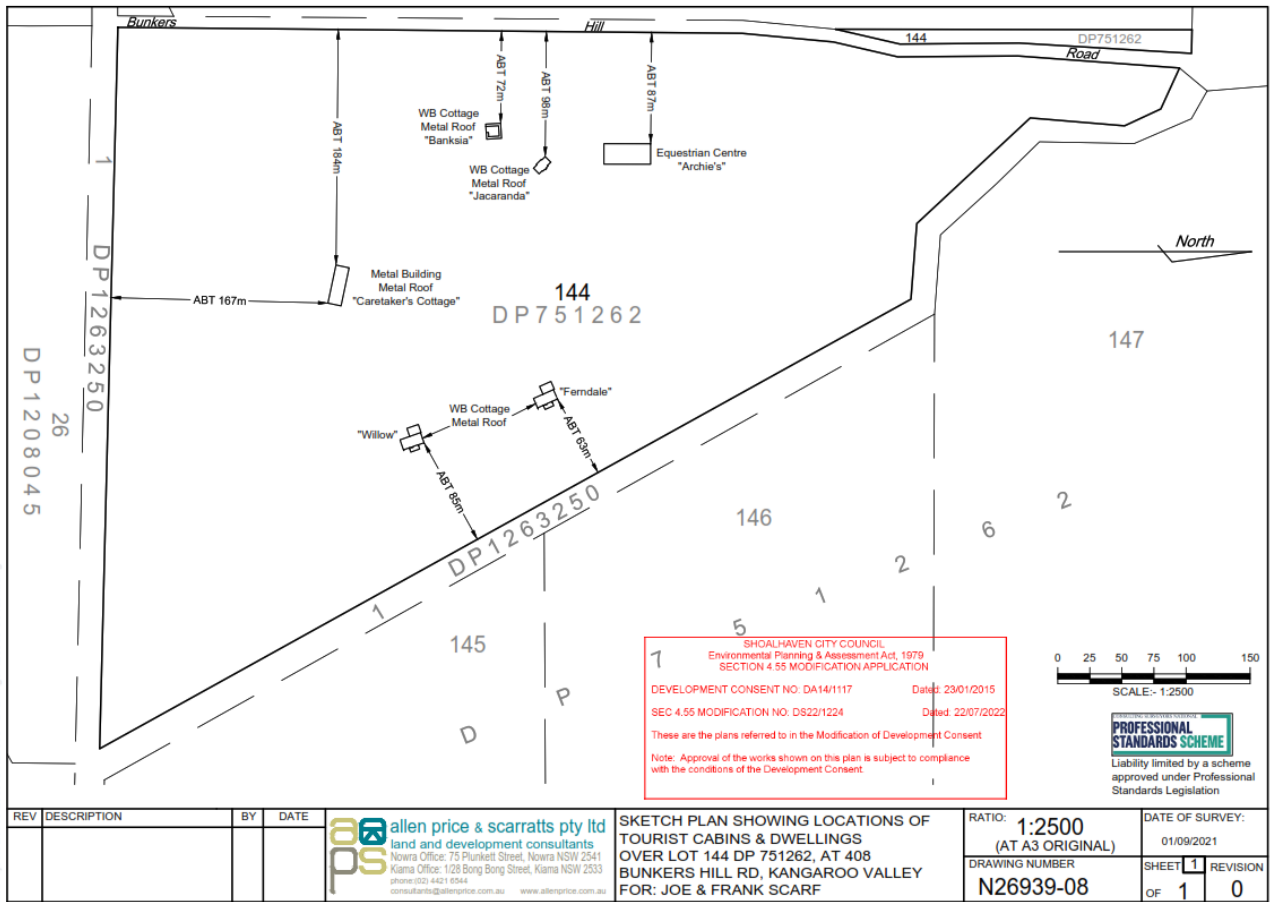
Approved site plan from DA14/1117 (As modified by DS22/1224).
